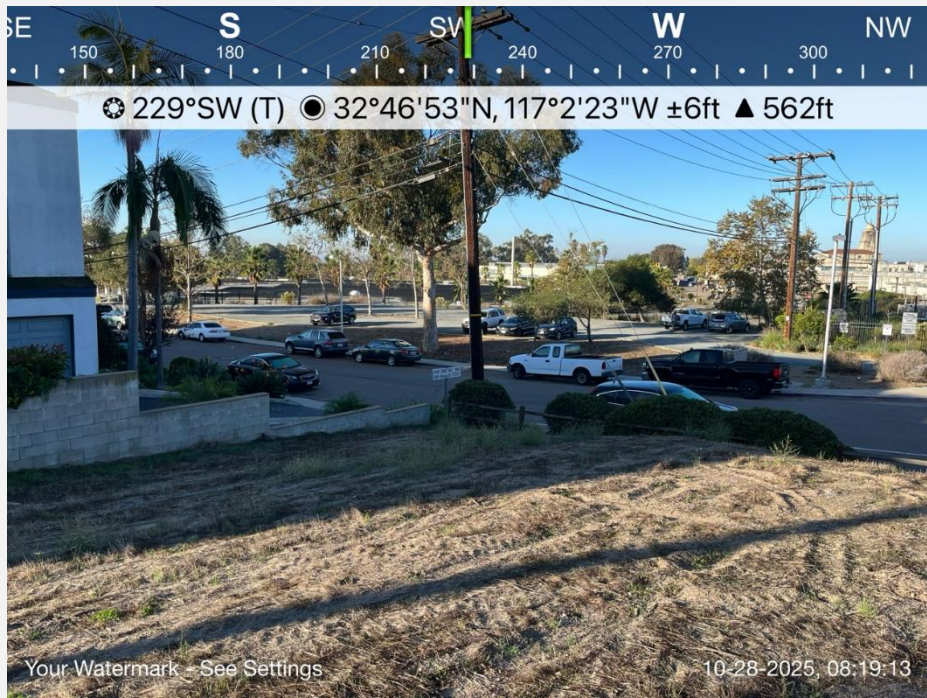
Work Location 653+97; facing southwest. October 28, 2025.
